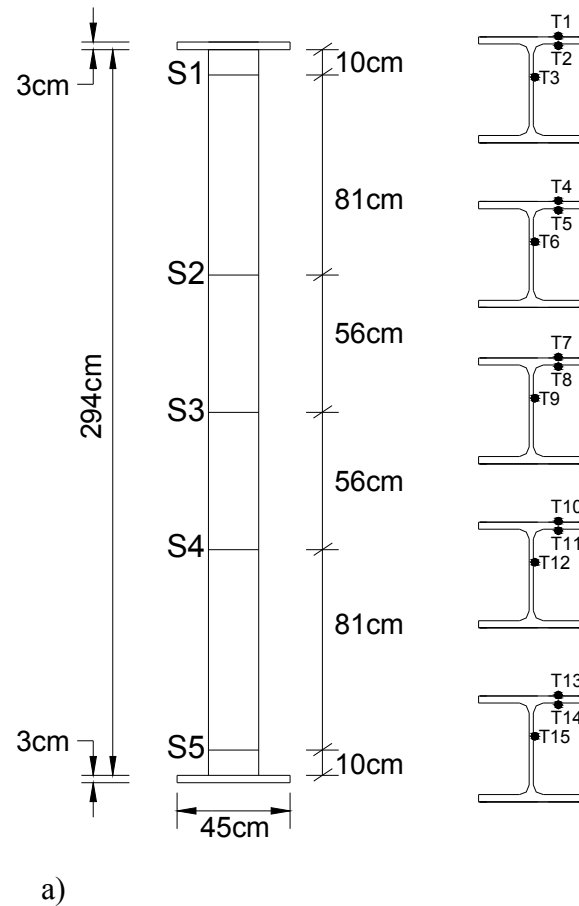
Steel specimens with position of the thermocouples a) View and definition of measuring sections b) Cross section geometry with position of thermocouples
